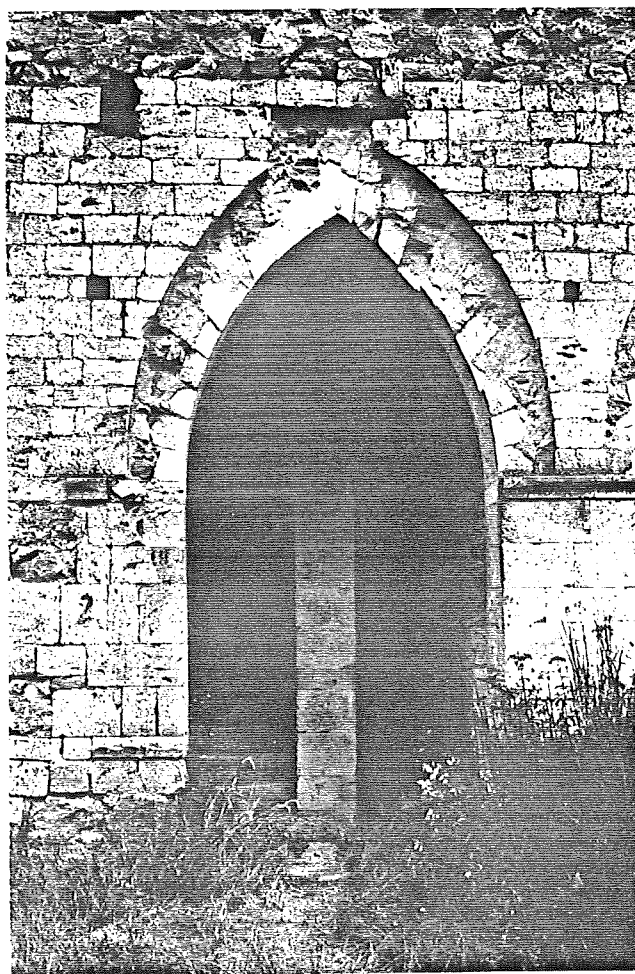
Northern arch of arcade of west facade of casa colonica that leads to staircase to upper floors (Appendix C, BUILDING PLAN, No. 12).
